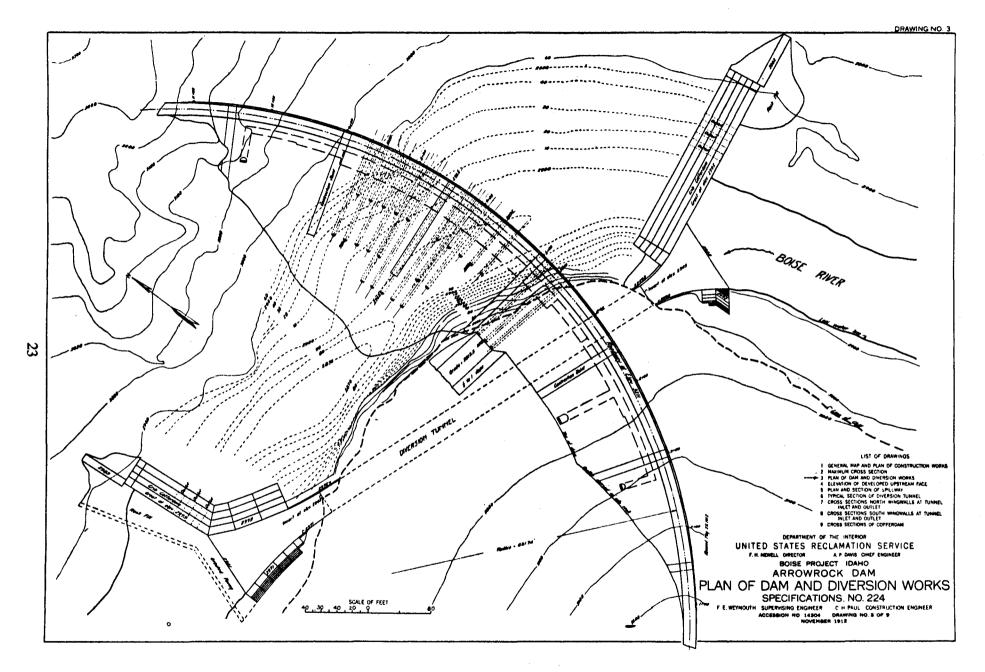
Arrowrock Dam, plan of dam and diversion works.
